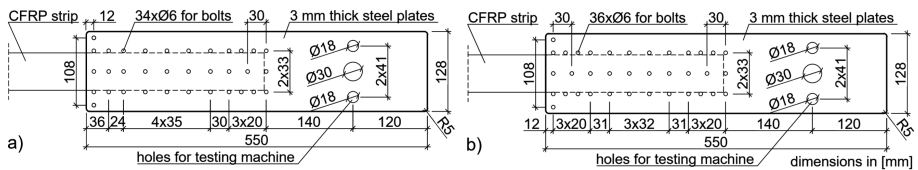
Layout of mechanical fasteners in the anchorages in series: (a) S1S-S4S, (b) S5S
